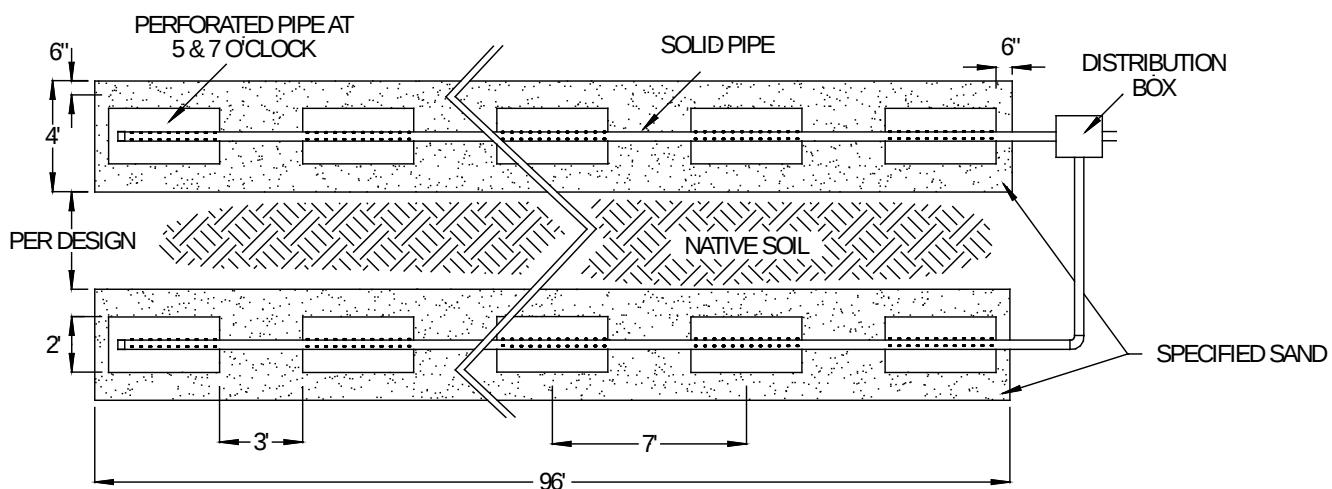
SECTION VIEW – 600 GPD – TRENCH SYSTEM – LEVEL SITE
